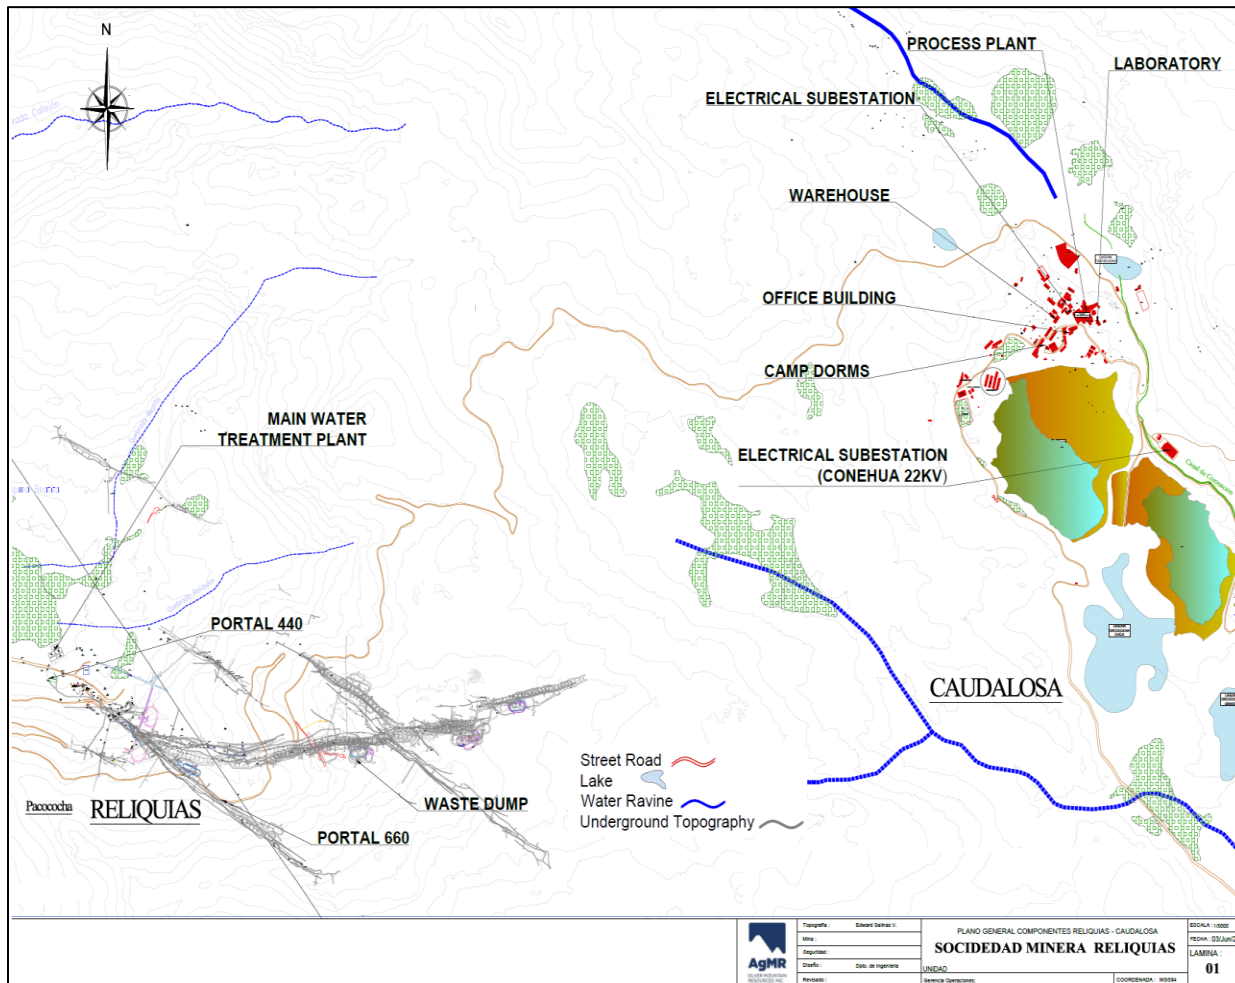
Infrastructure Layout Plan. Source: SMR 2024
